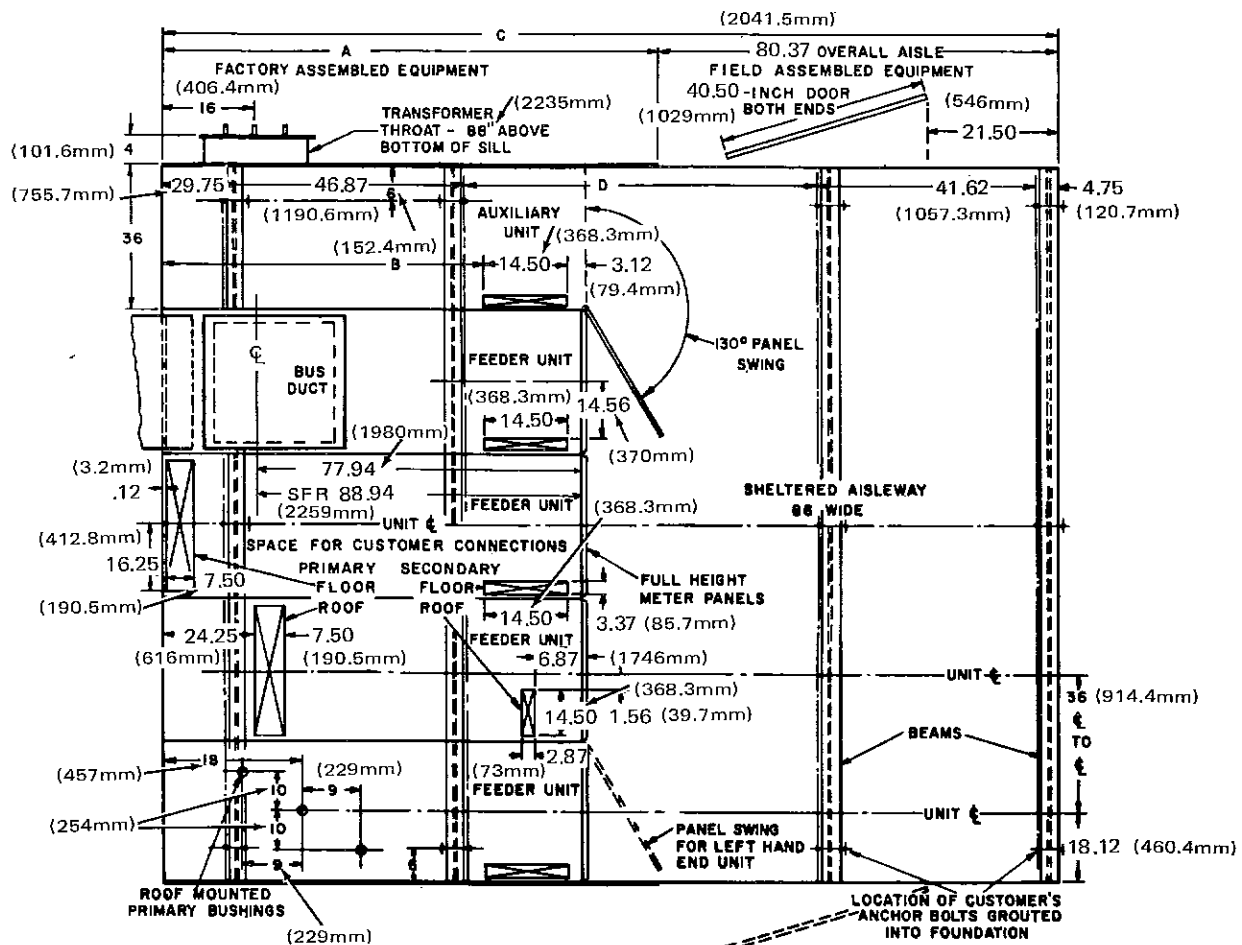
Floor Plan and Typical Side View of 5 kV Single Aisle Shelter-Clad Cubicles
